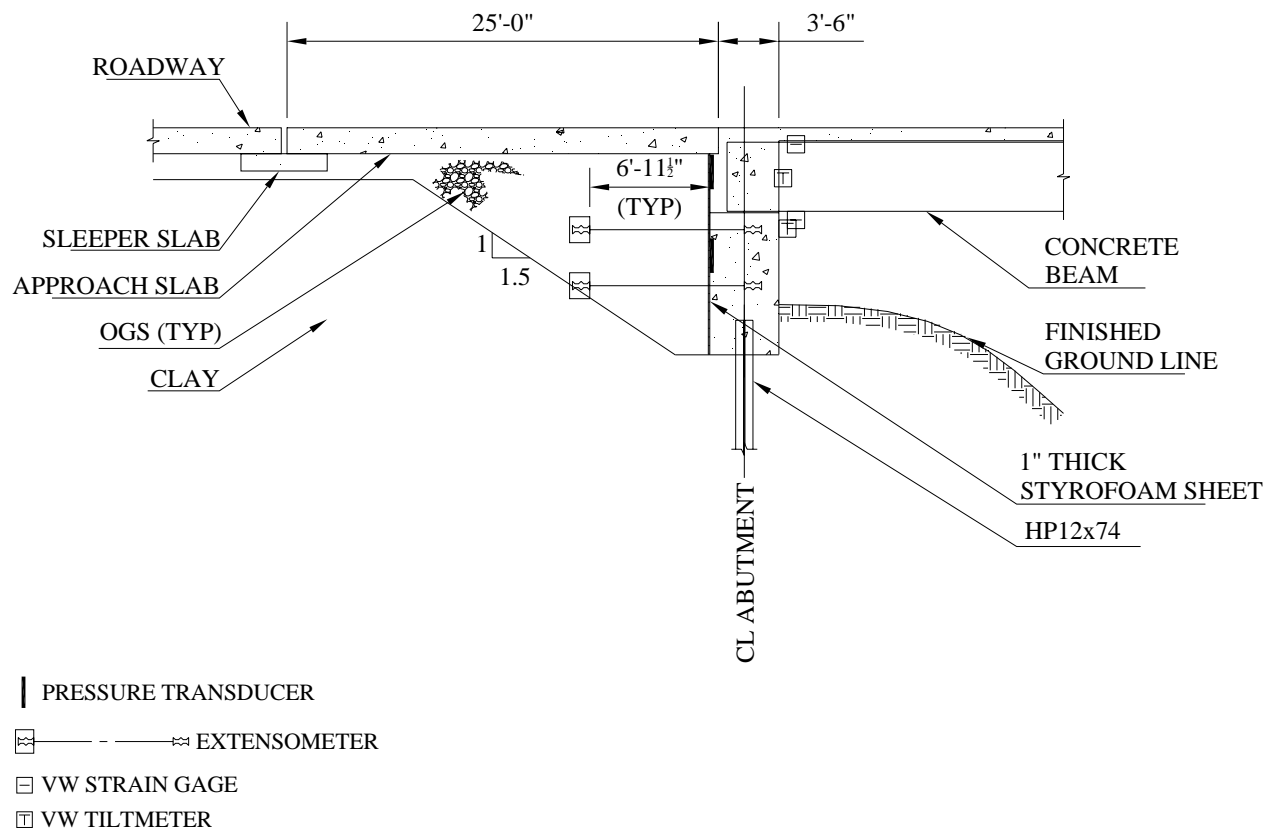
Structure 222 Cross-Section Through Abutment 1 (Section D-D).
